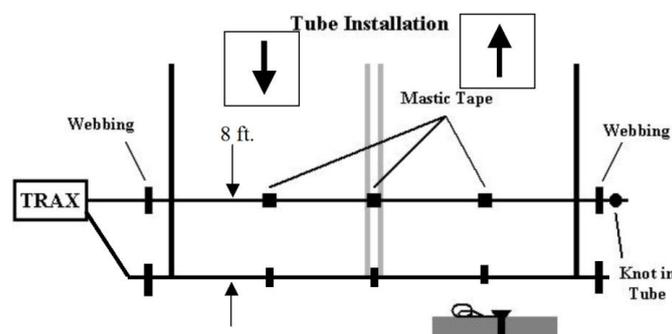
Road tube layout (Mcgowen & Sanderson, 2011)
